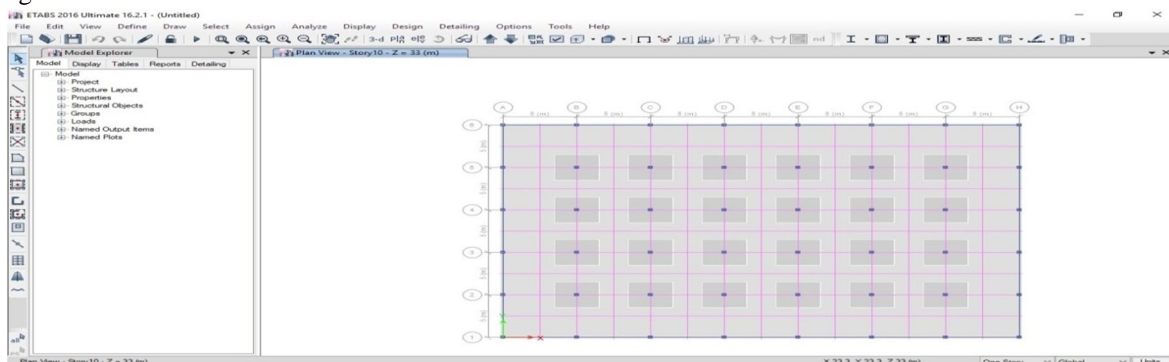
Top View (Plan) of flat slab with perimeter beams
